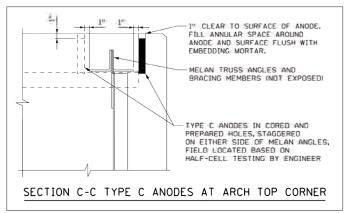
Typical detail for arch corner repair where concrete was sound but half-cell testing indicated potential for active corrosion
